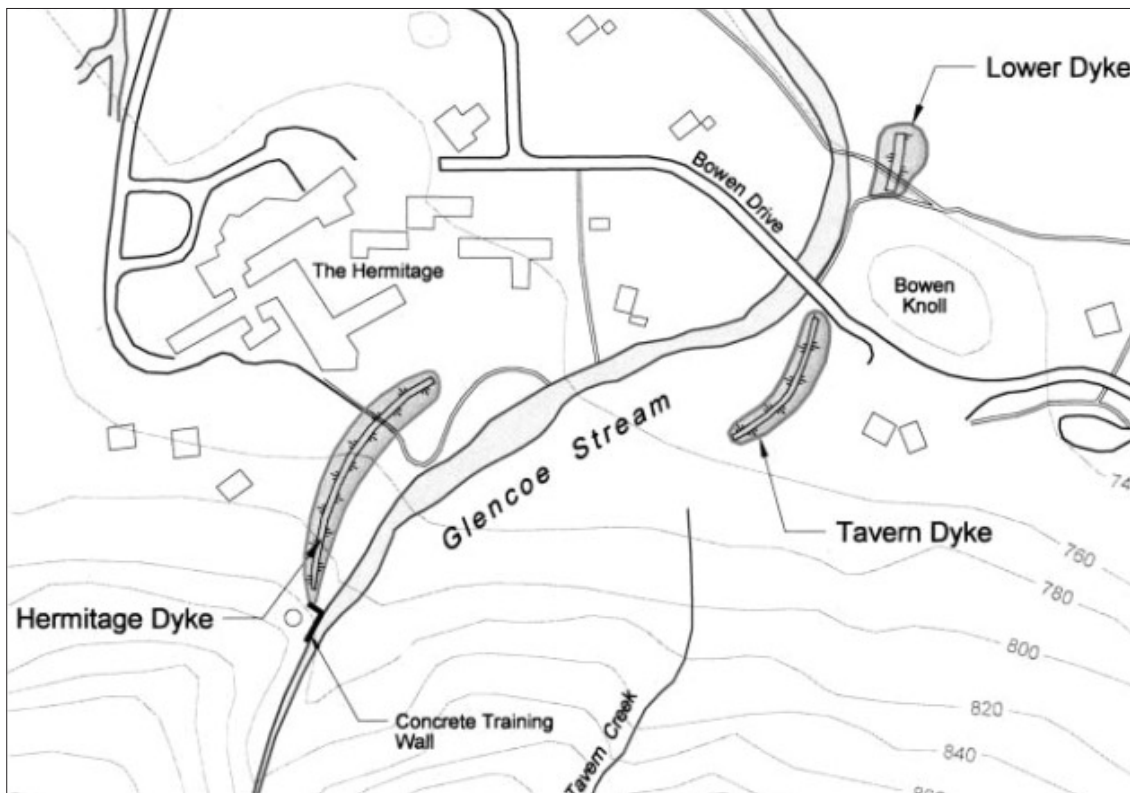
Location of lateral berms constructed at Mount Cook Village (Skermer et al, 2002)
